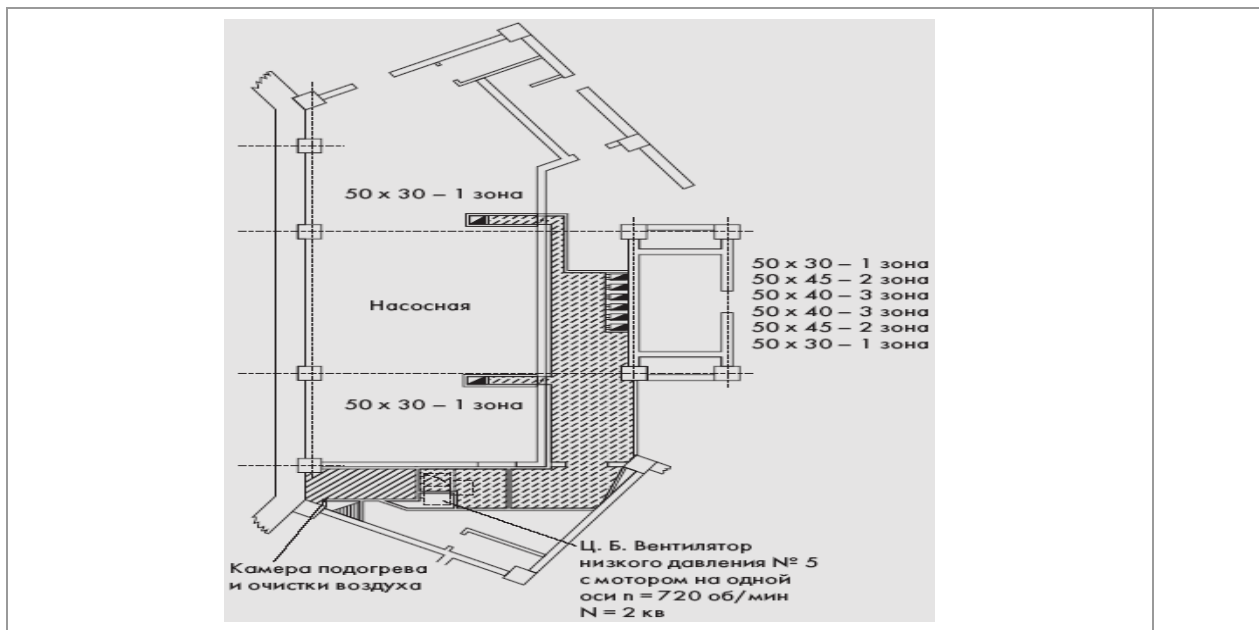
(more details) Ventilation of a high-rise residential building. Basement floor plan
